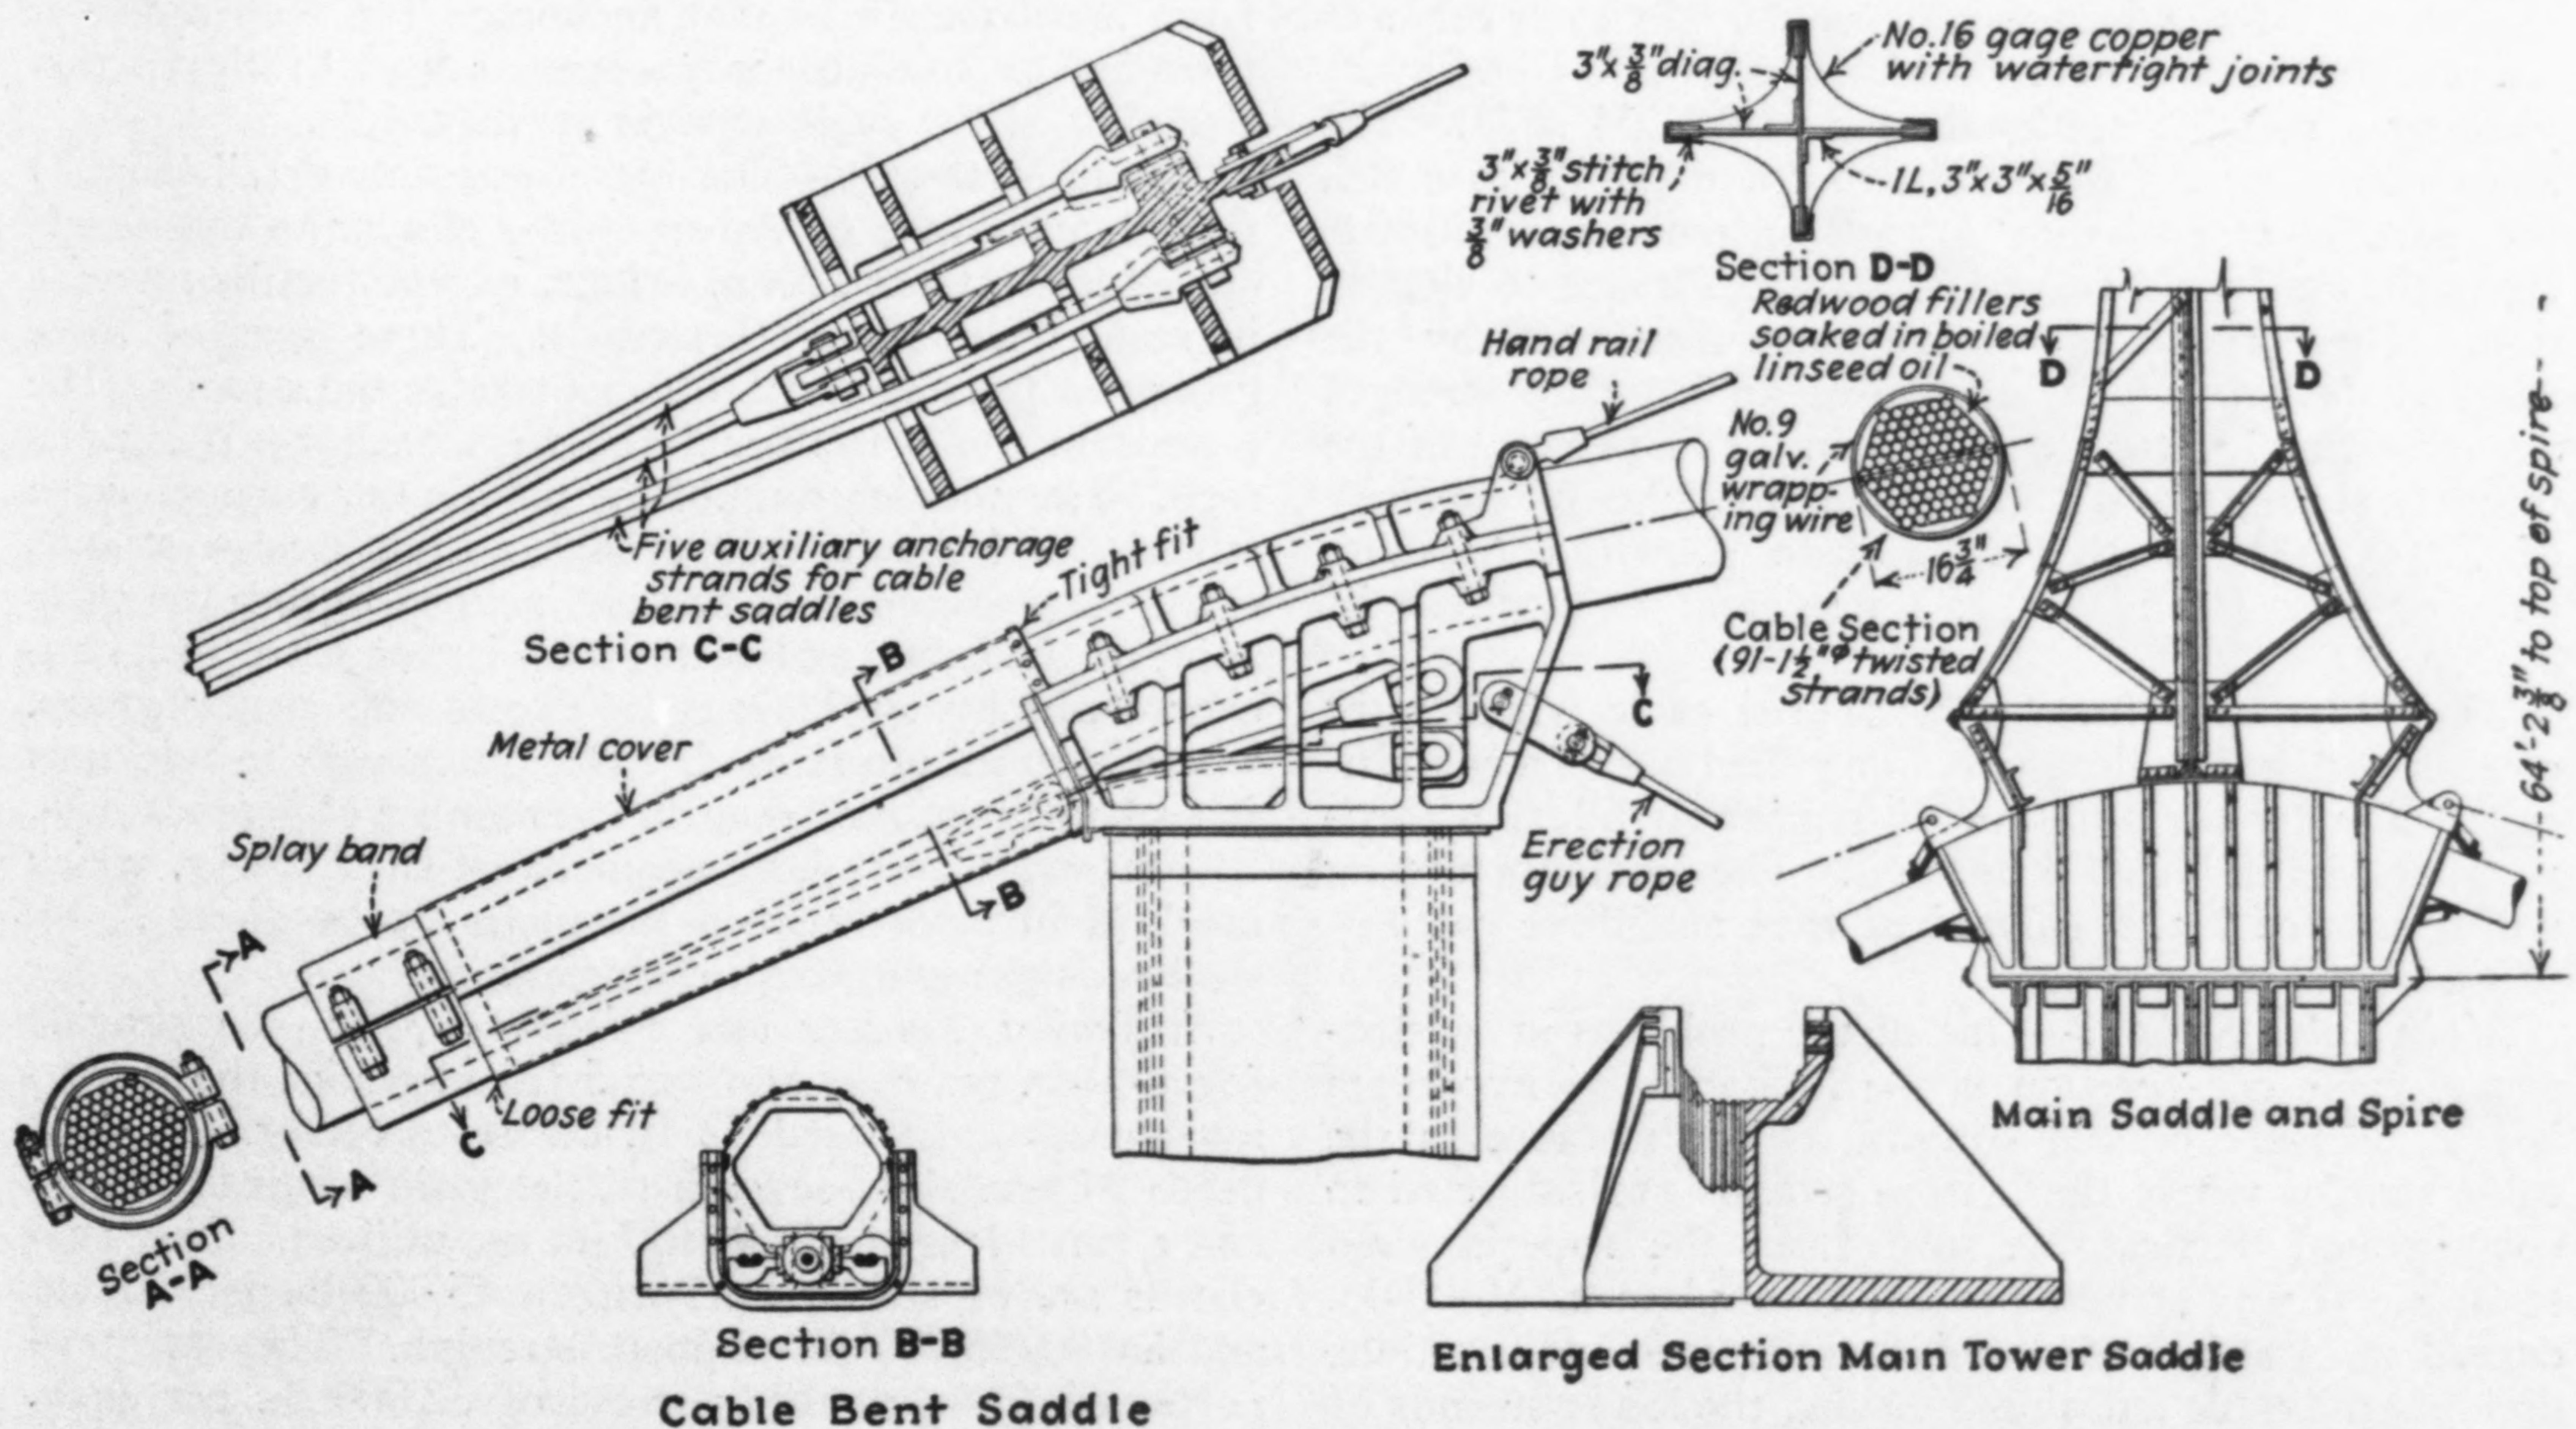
SADDLE DETAILS FOR ROPE STRAND CABLE SUSPENSION BRIDGE
